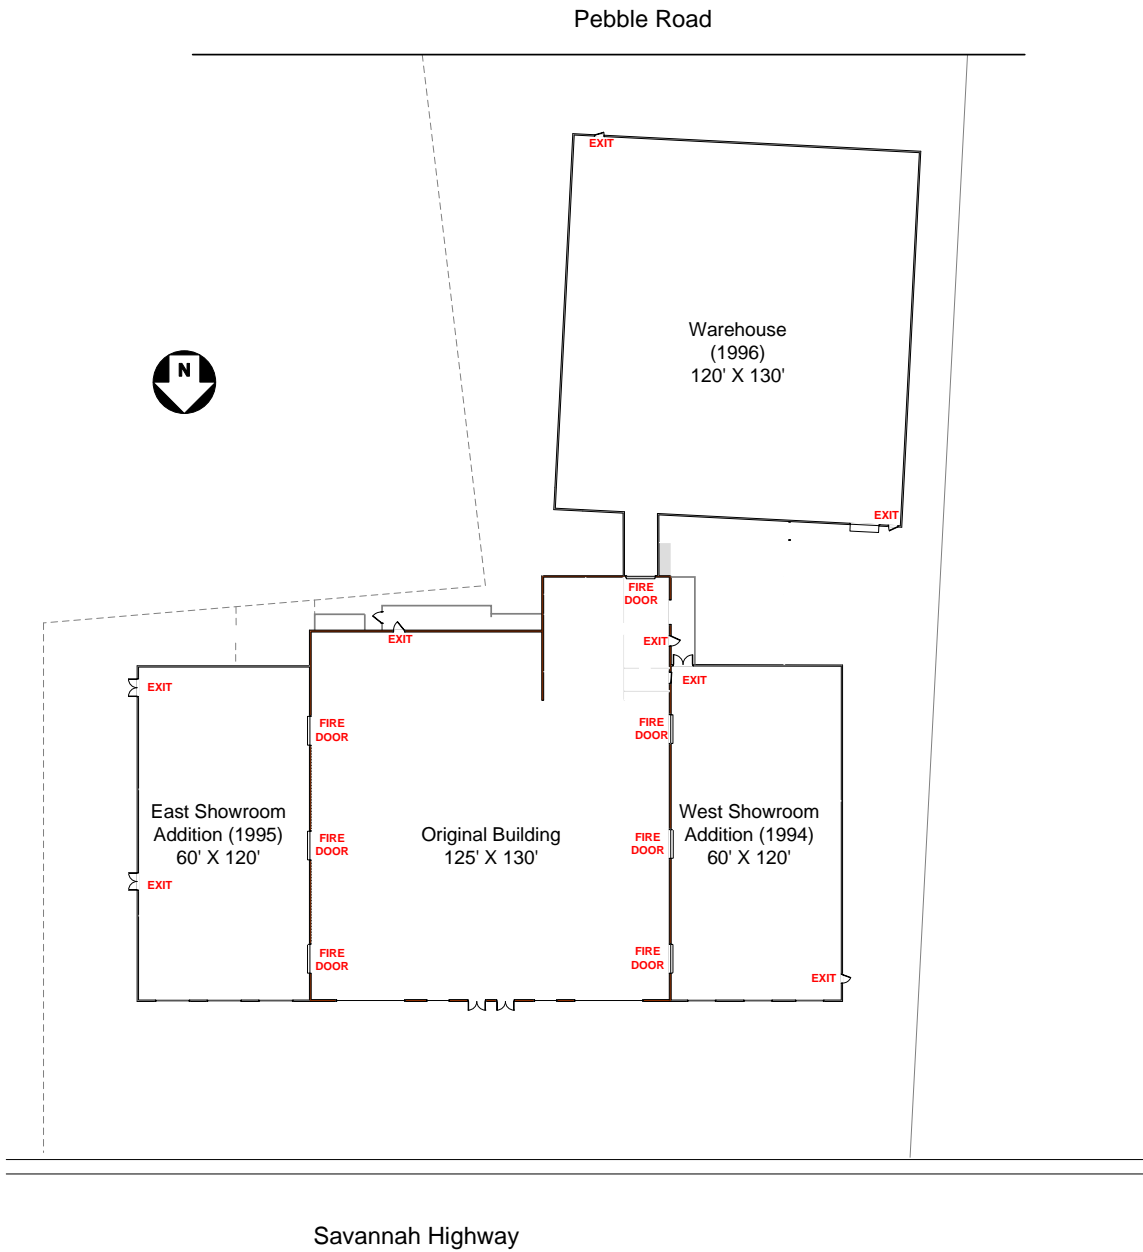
Site plan indicating 4 permitted structures as of 1996. Roll-down fire doors and exits are indicated.
